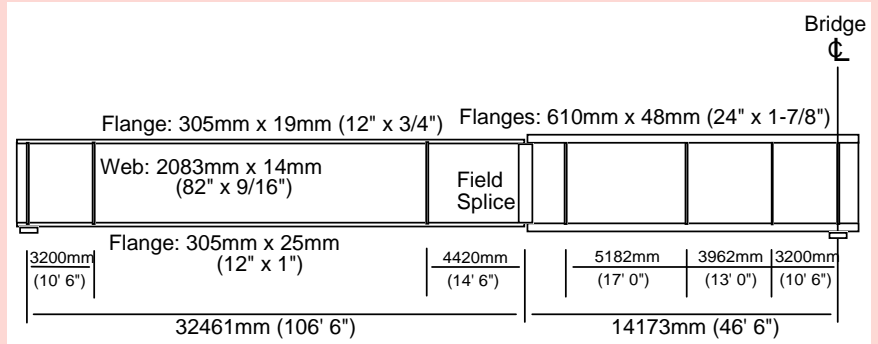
Elevation View of 7 Girder 345W (50W) Steel Bridge
